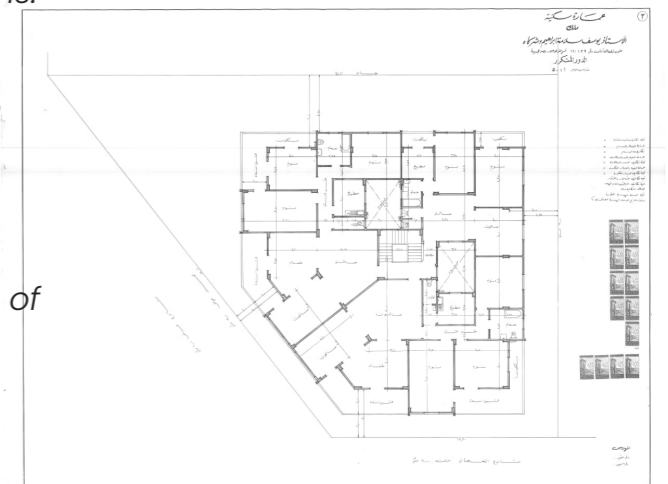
Repeating floorplan for building J.<sup>42</sup>
